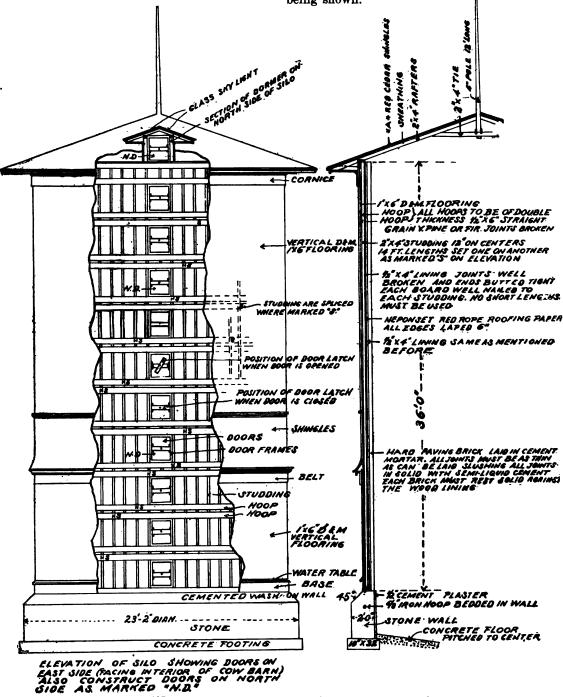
COMBINATION CEMENT SILO (ELEVATION IN DETAIL).
